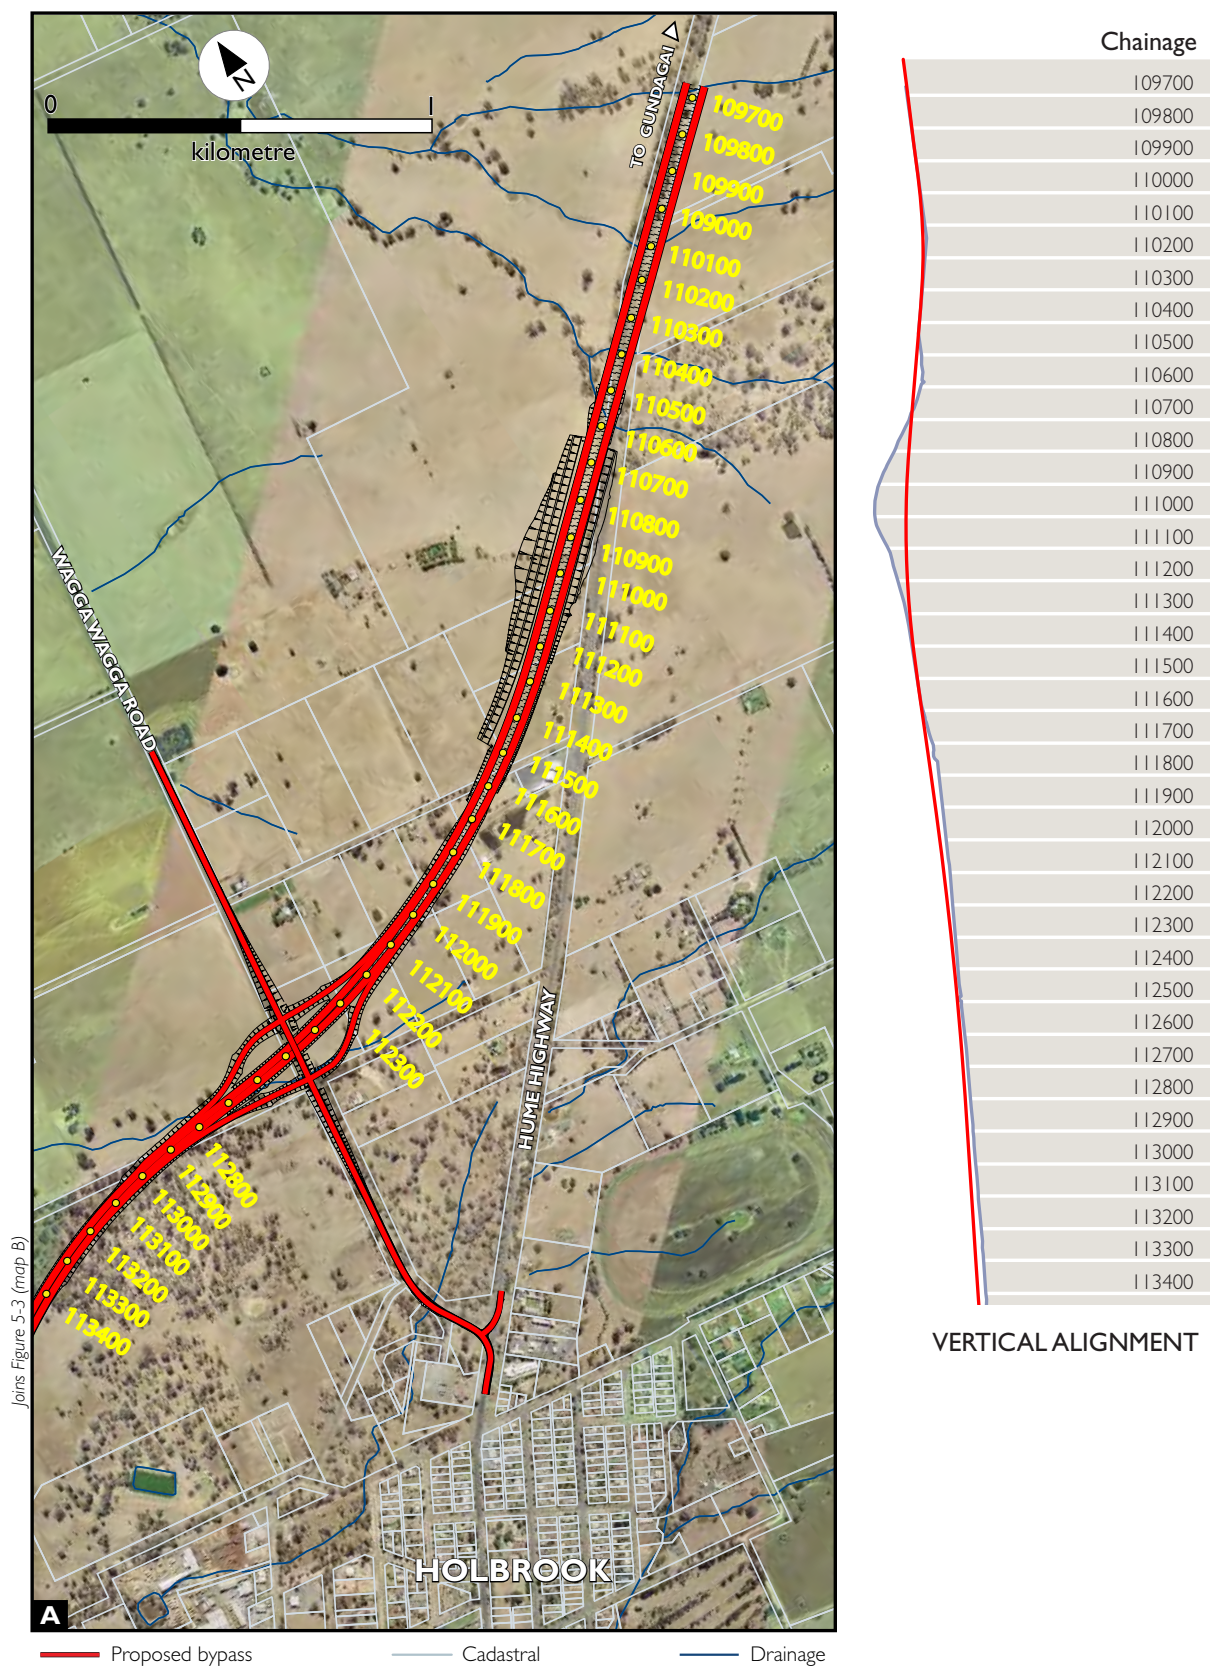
Proposed bypass horizontal and vertical alignments (northern section)
